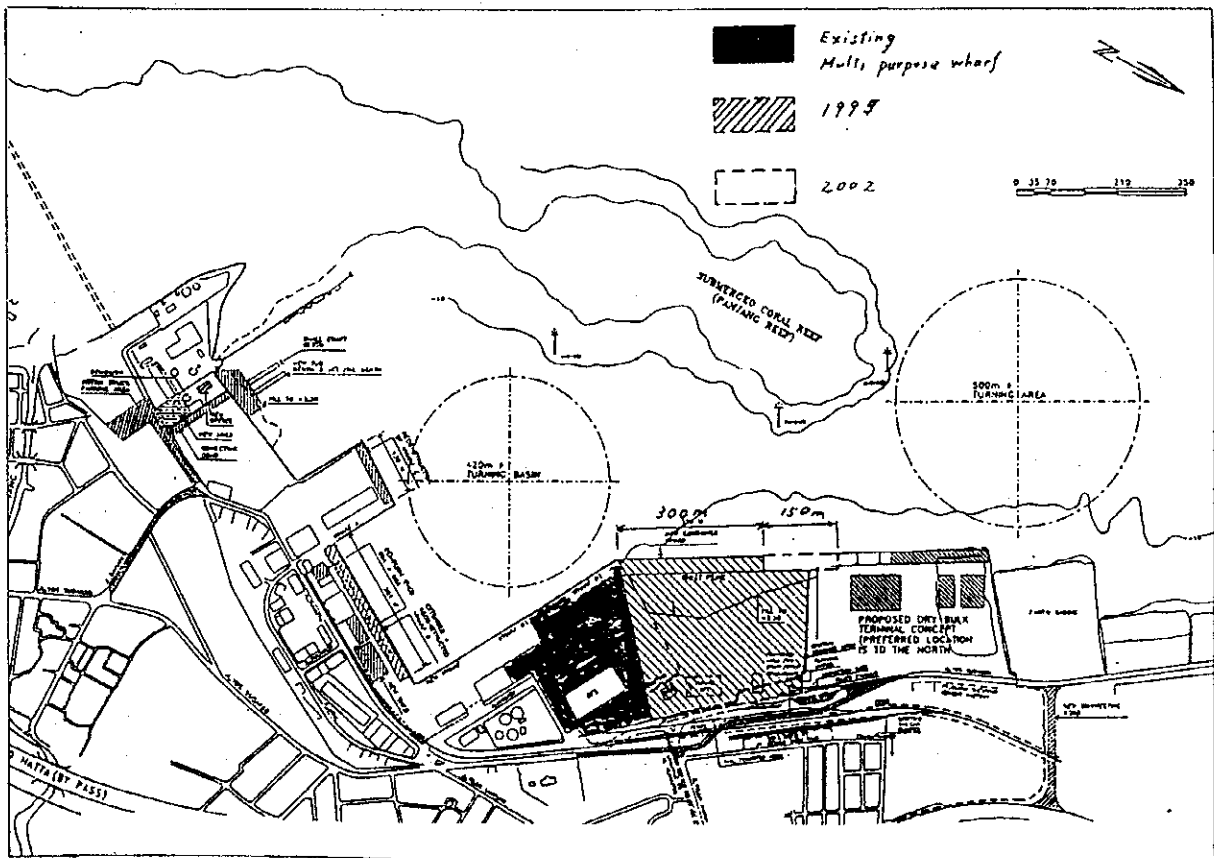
Existing Container Terminal Development Plan (2): Panjang (South Sumatra)
